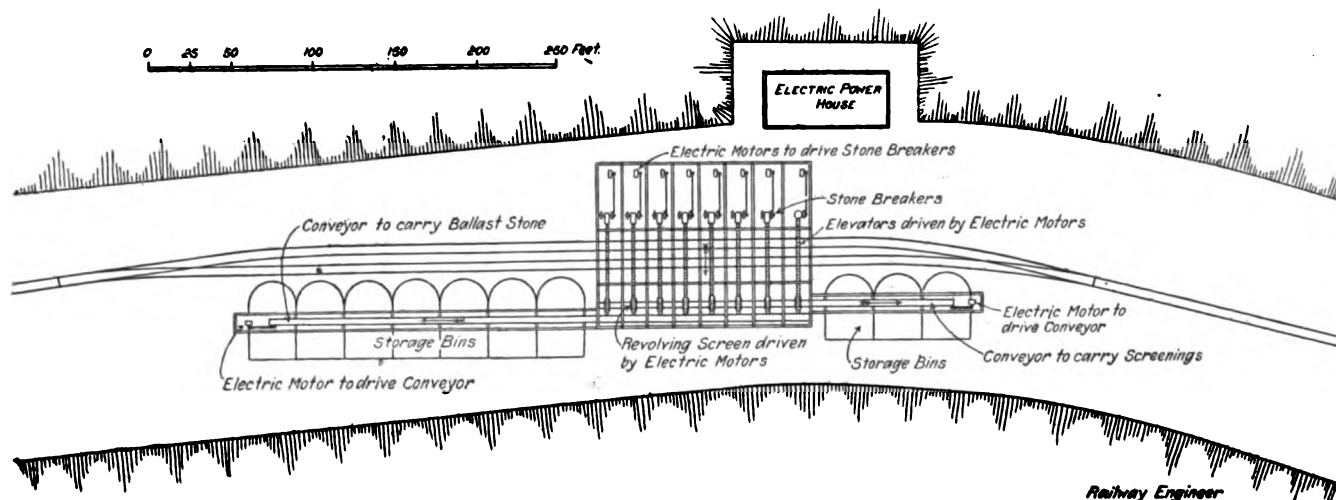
General Plan of Stone Crushing Plant for Railway Ballast.
